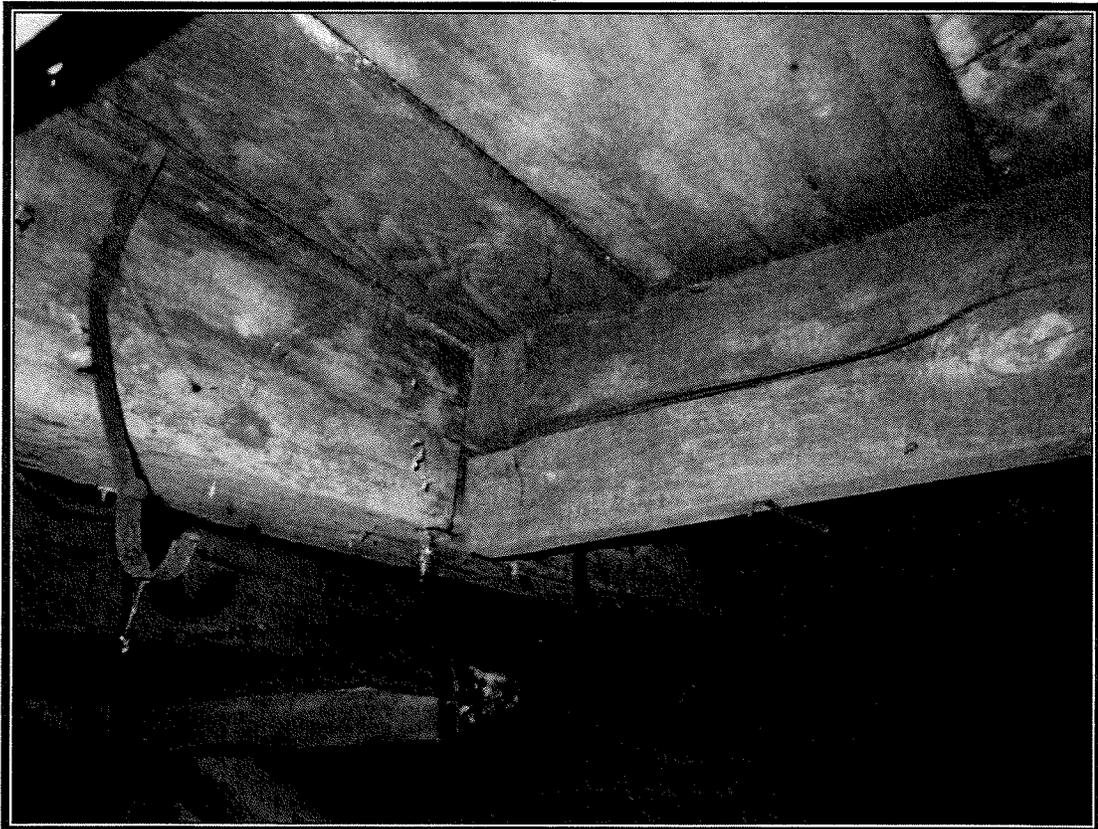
An example of a severely deteriorated floor joist having split due to excessive notching.
